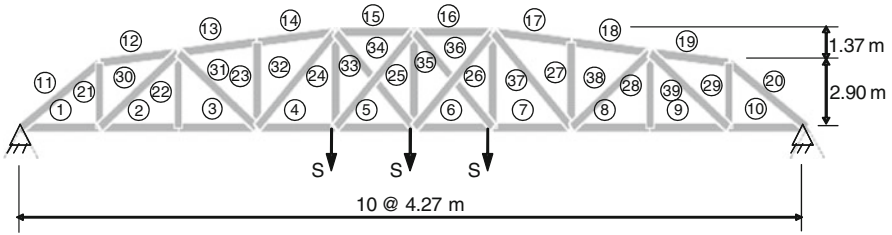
Geometry, loading and member ID numbers of truss bridge
